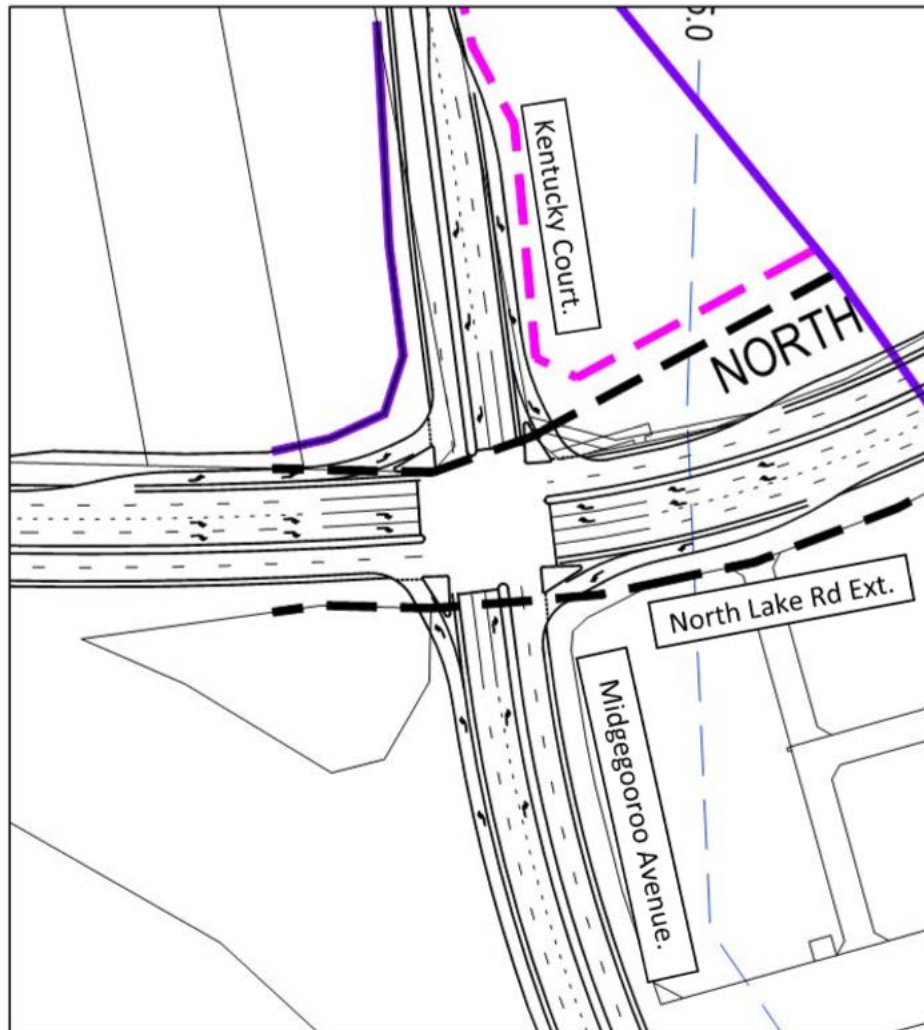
North Lake Road/Midgegooroo Intersection Layout
